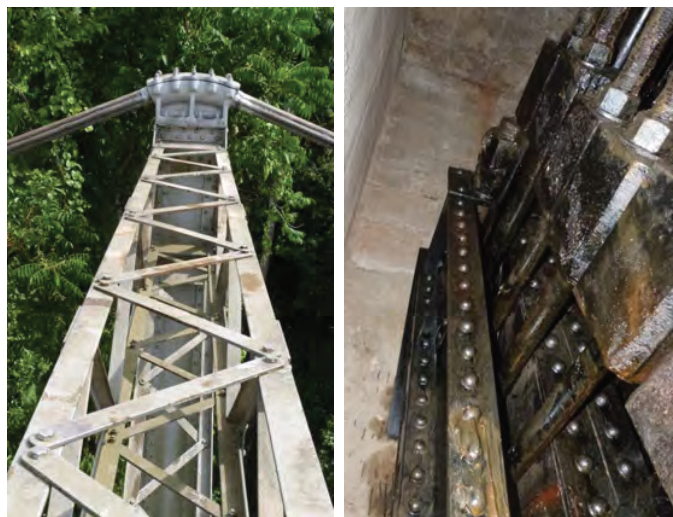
Cables saddle (left) bottom Underground cable anchor (right)
